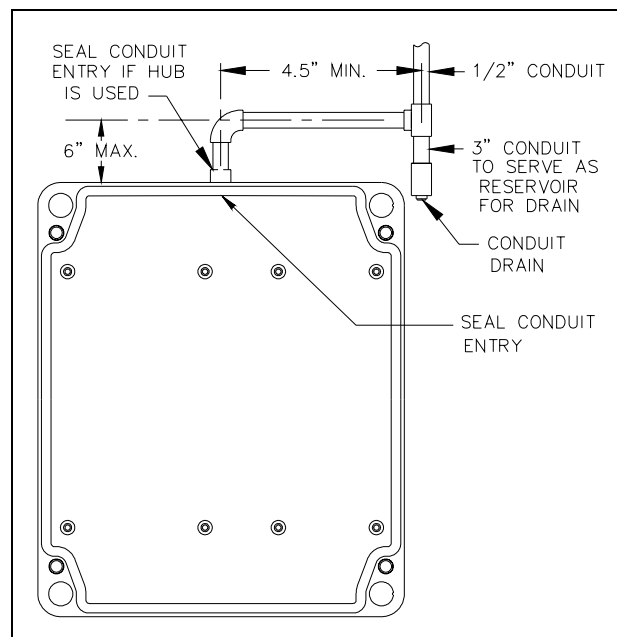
Top entry conduit installation details for metallic enclosures (NOT recommended)
